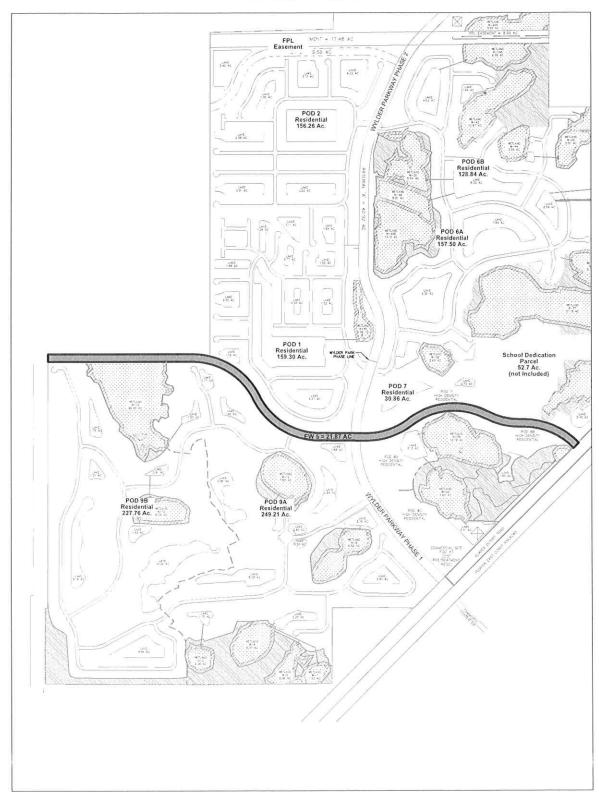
SITE PLAN LTC RANCH - POD 9
